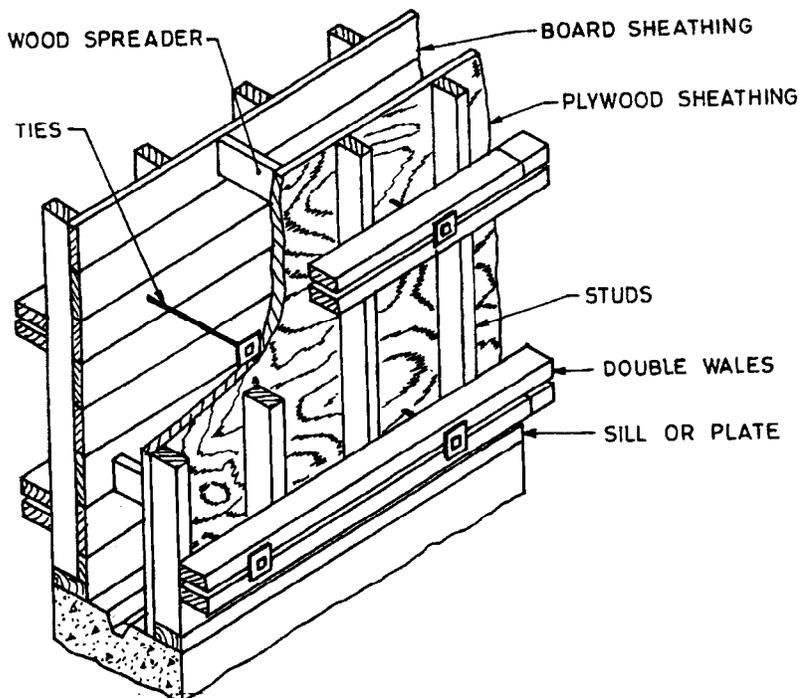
TYPICAL WALL FORM SHOWING WALL TIES
